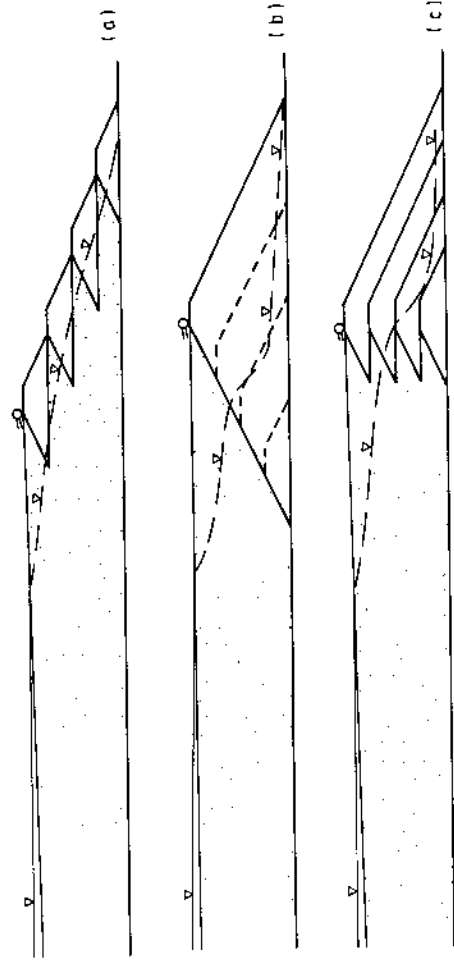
Internal seepage a) upstream embankment; b) downstream embankment; c) centerline embankment.
